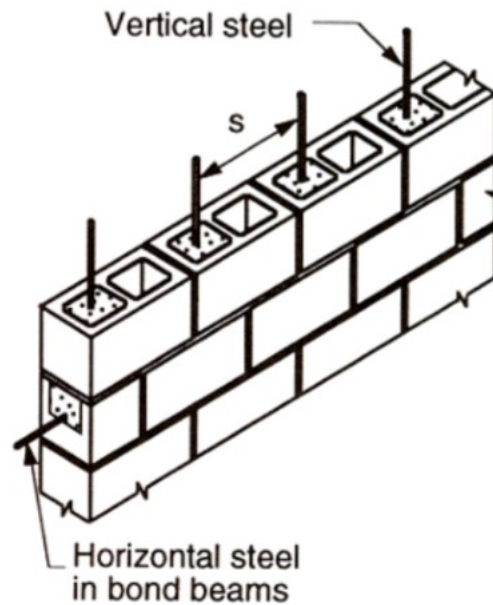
Reinforced Masonry Wall (Minaie et al. 2009)
